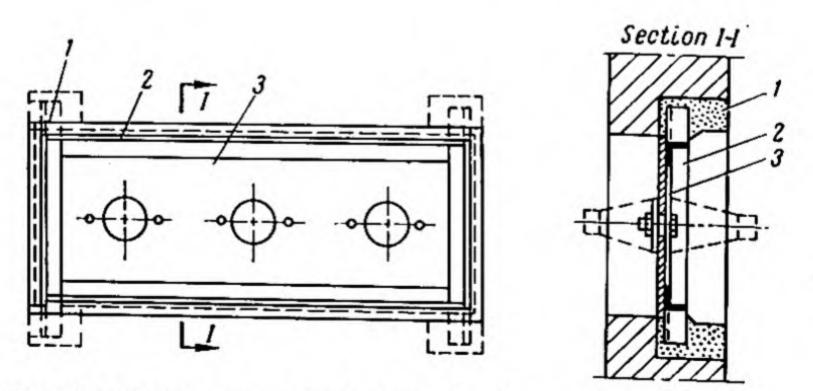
Bushing mounting in form of a frame made of angle iron:
